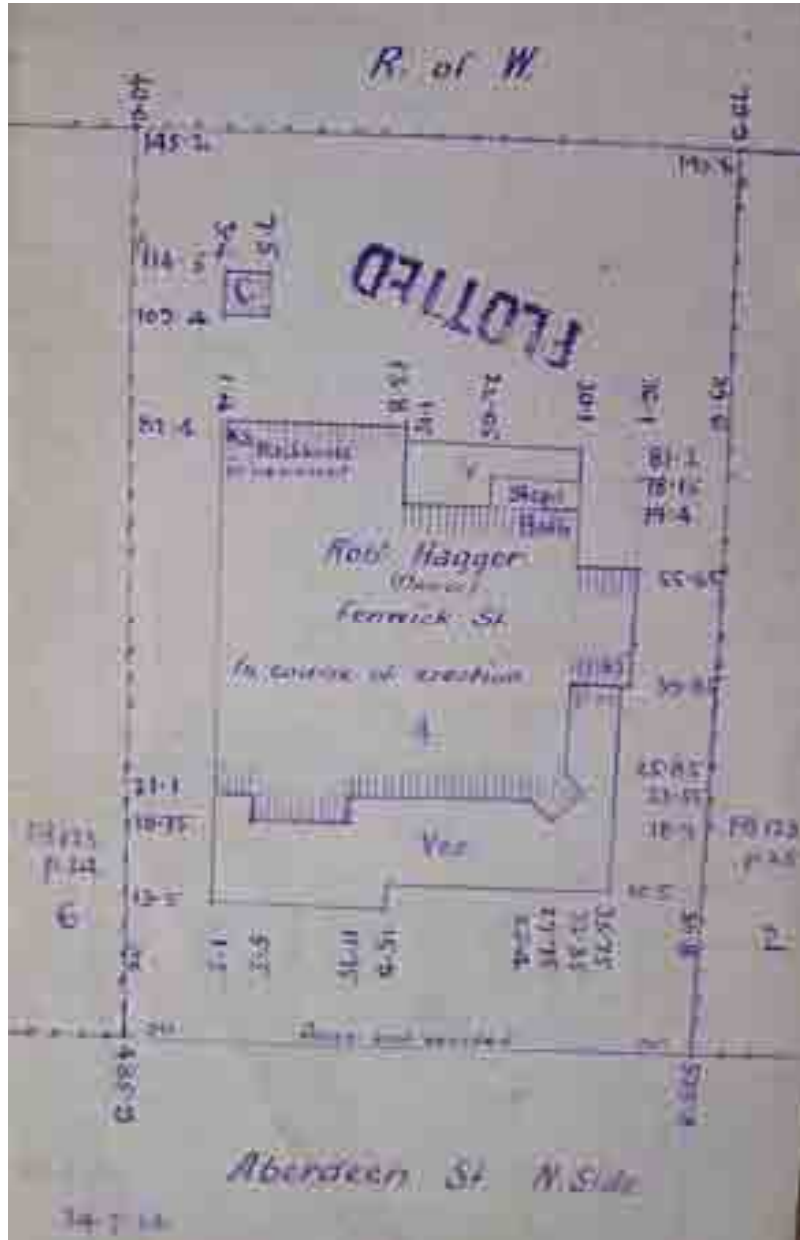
Sketch plan of “Ardora House”, 4 Aberdeen Street, 24 July 1914, showing annotation that reads “washhouse in basement”. Source: Geelong Waterworks & Sewerage Trust Fieldbook, no. 33, p.145, Barwon Water collection.
